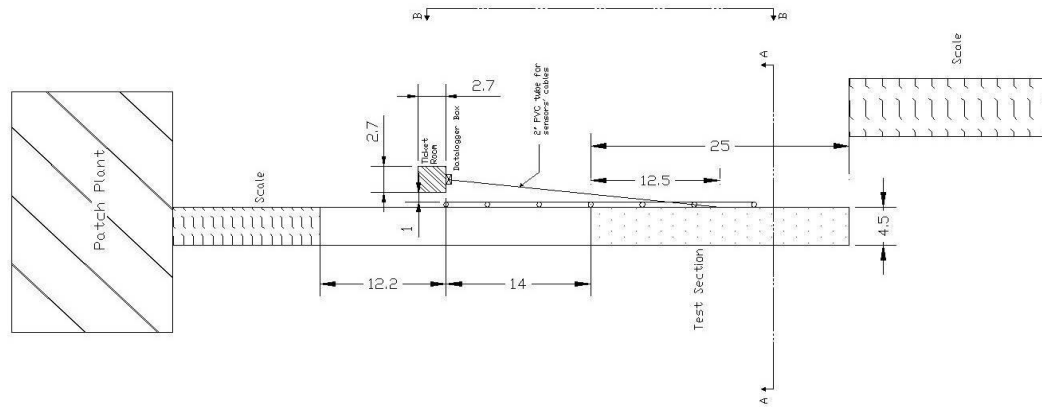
Plan of the Guelph Capital Paving Inc. Section
